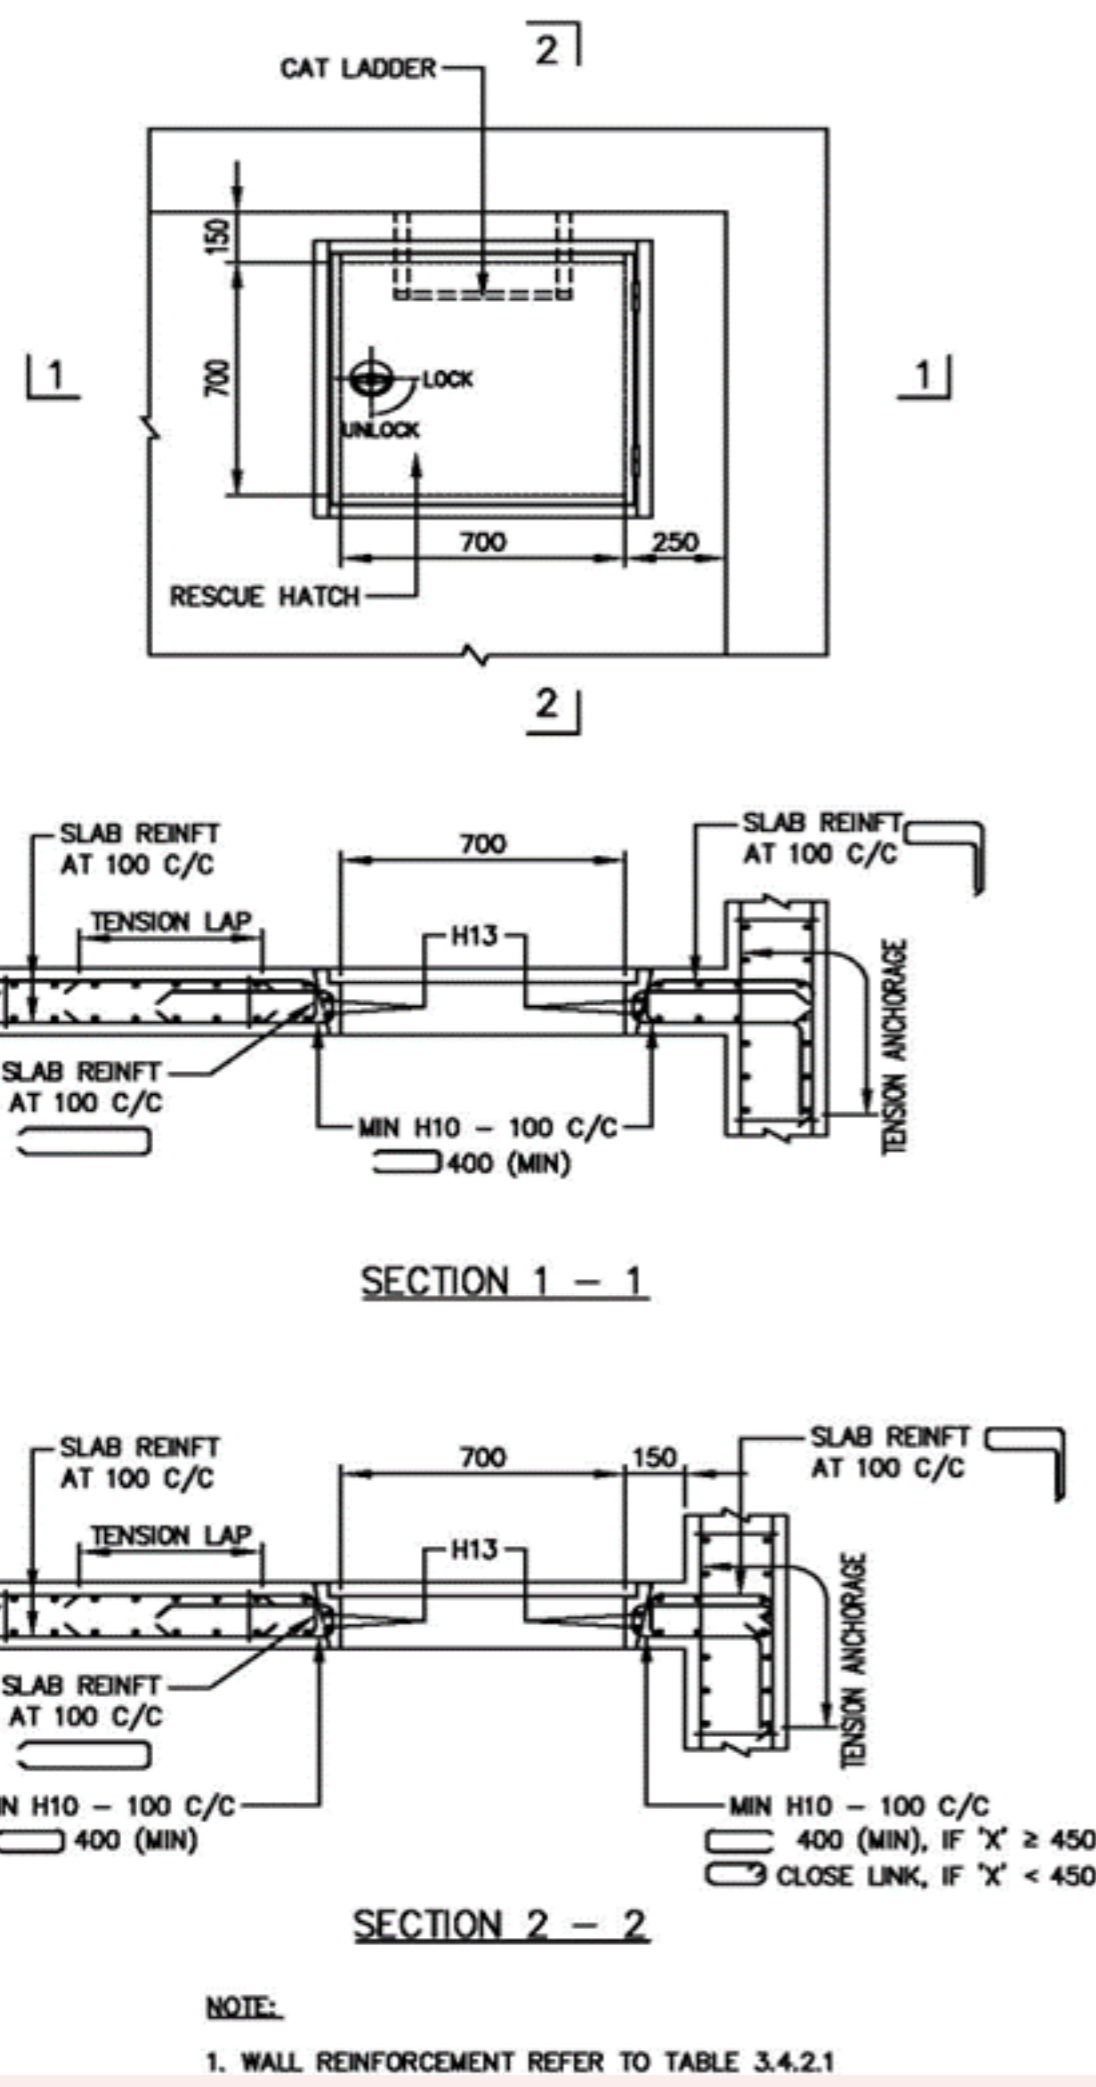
(j): REINFORCEMENT PLAN DETAILS FOR S/C SS
